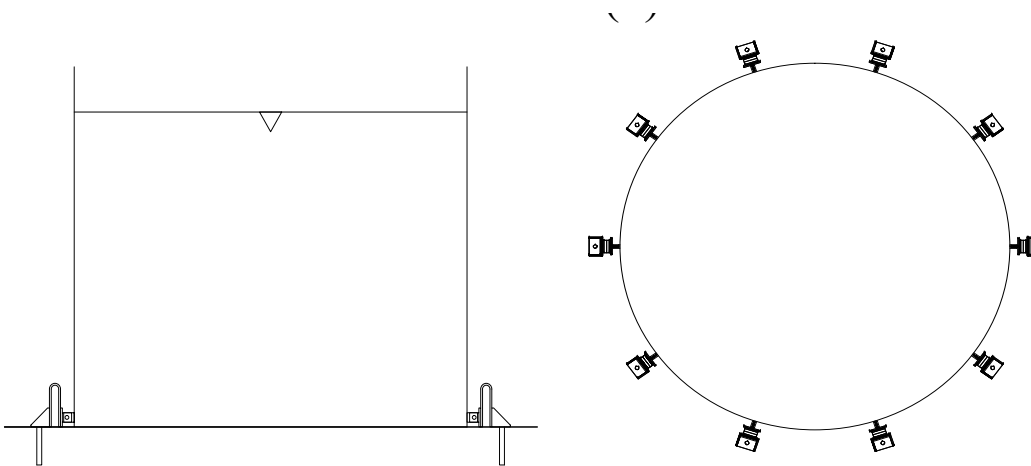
Continuously supported storage tank anchored with U-shaped strip dampers. (a) elevation simplified view; and (b) plan simplified view.
